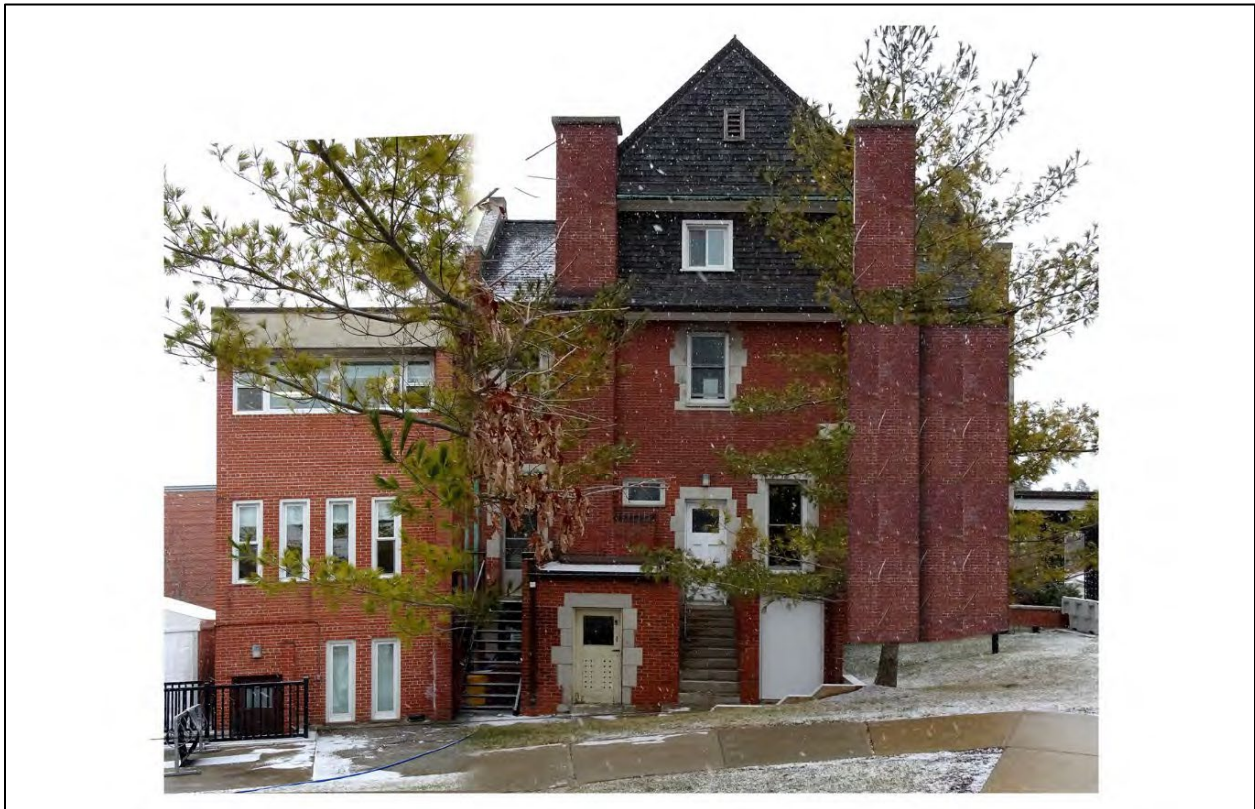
View of west elevation of 306 Lawrence Avenue East, c.1970s addition to the left and cold storage room in the center of photograph (Stevens Burgess Architects Ltd., 2025).
